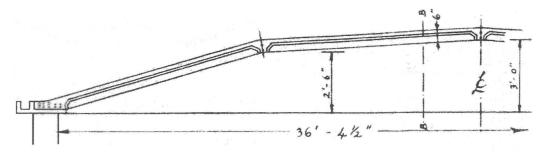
Kingsmead School, London. Details of the folded plate roof over the hall
